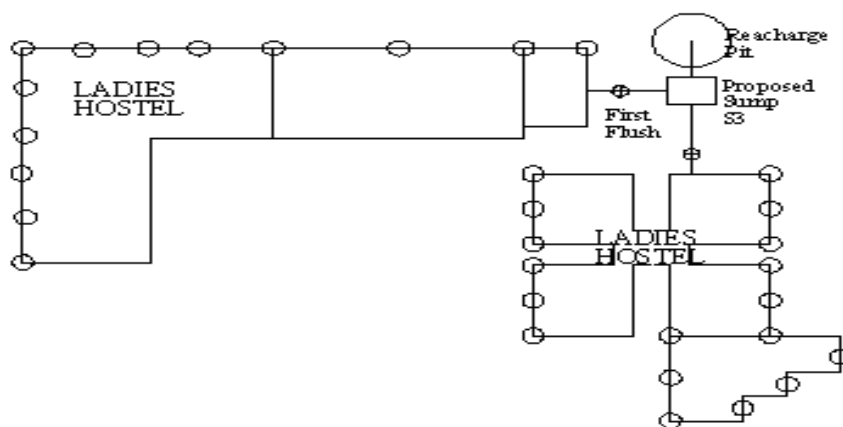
Schematic Plumbing Layout of Collection System for Sump S3
